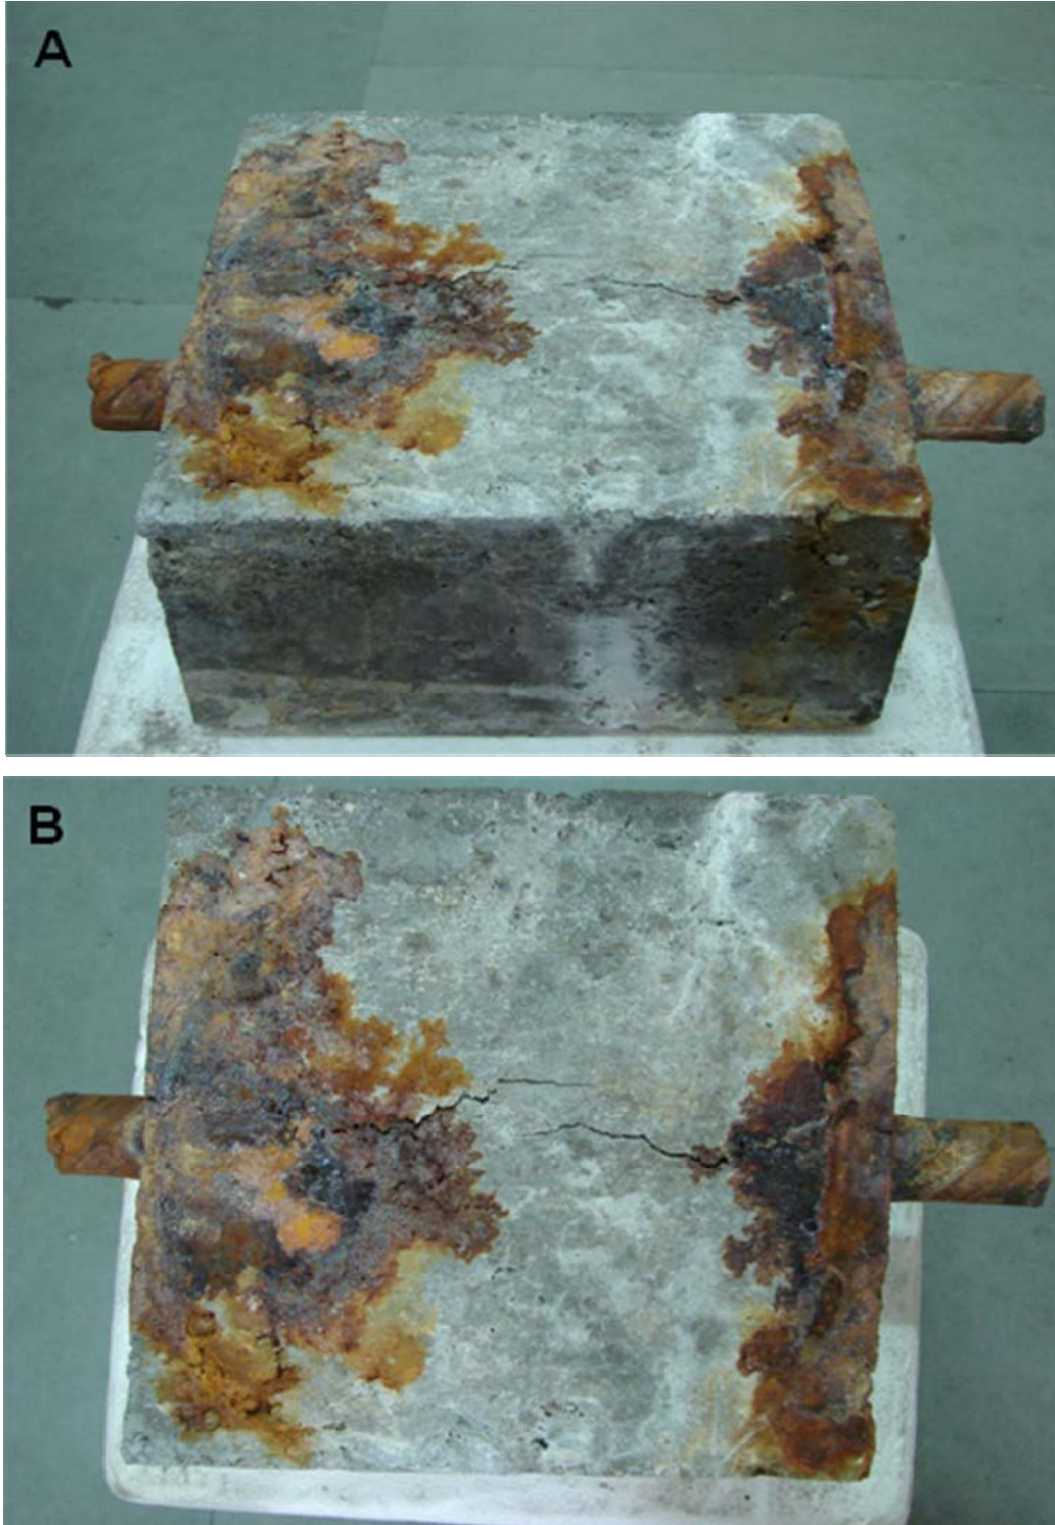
Visual inspections (A. horizontal view and B. vertical view) of cracks and rust developed after current induced corrosion on the control RC specimen
